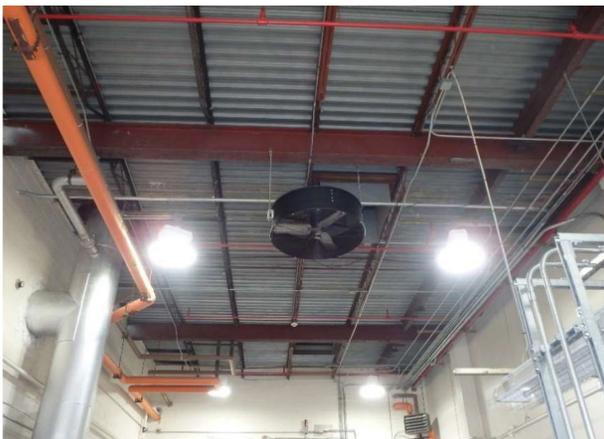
Installation of Building 6 new heating and ventilation units.
